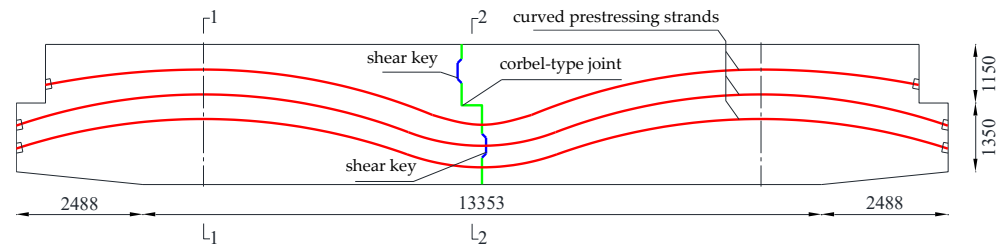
Half-section structural diagram of the prestressing strands in the cap beam
